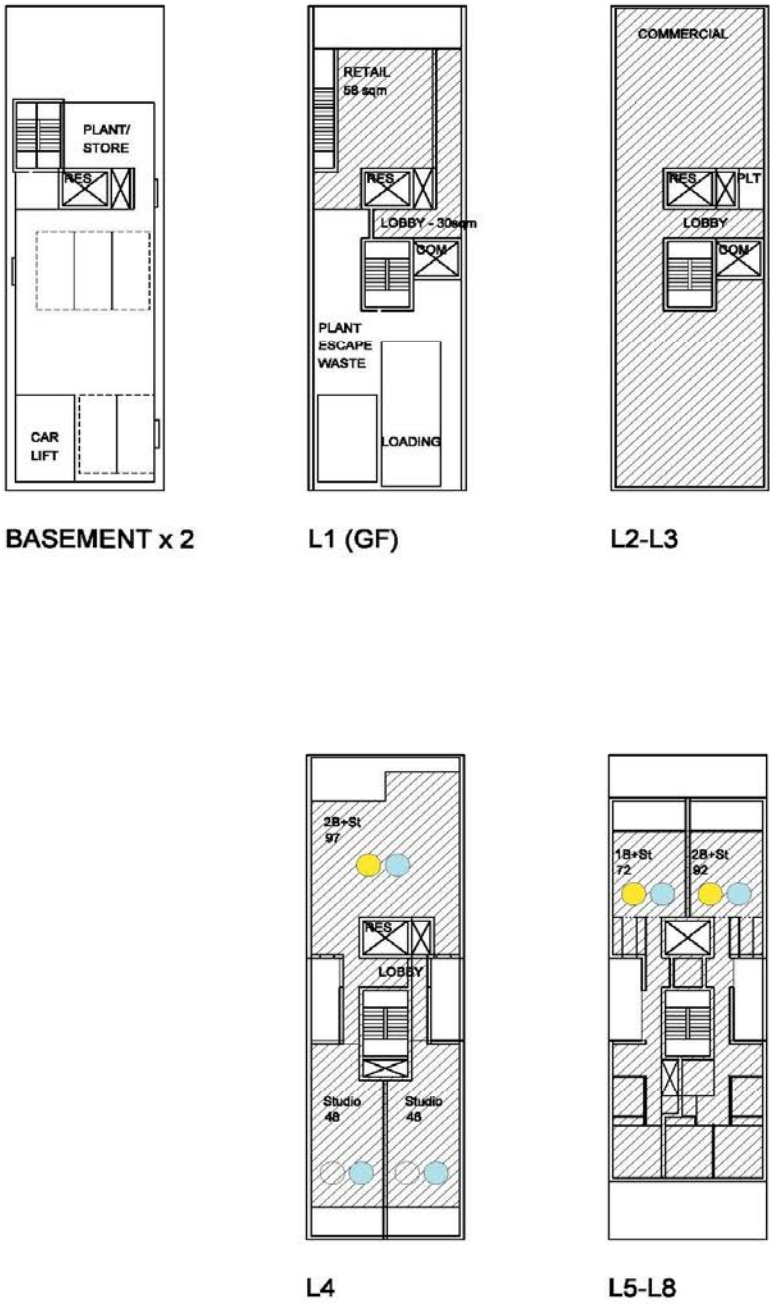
Indicative Floor Plans of 21 Atchison Street
